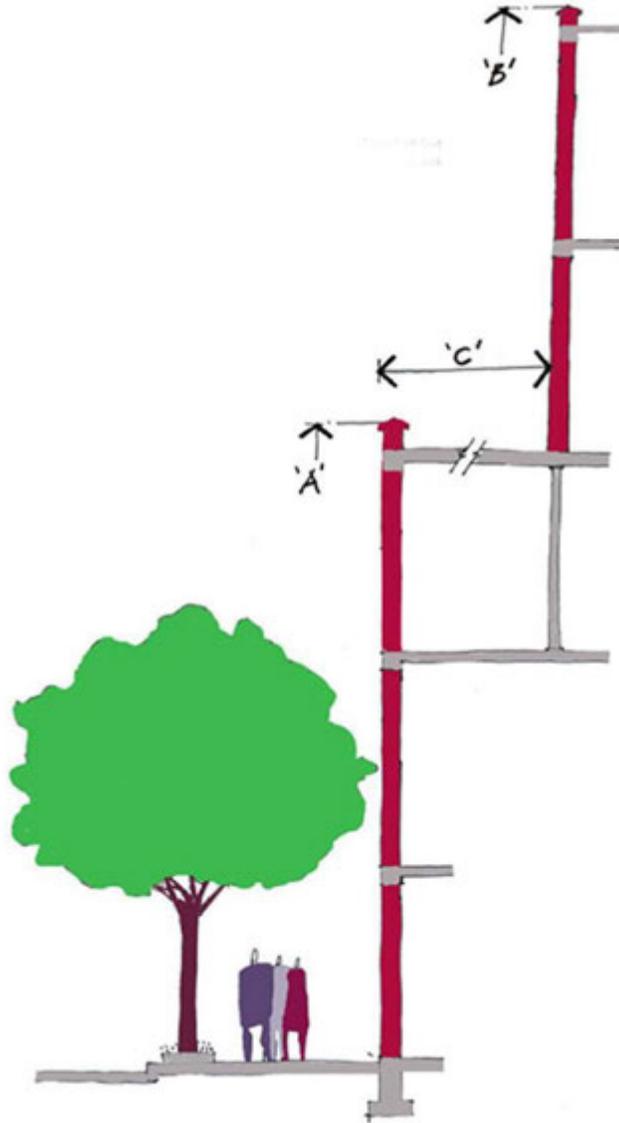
Illustrative Guidelines for Buildings Higher than Three Floors
